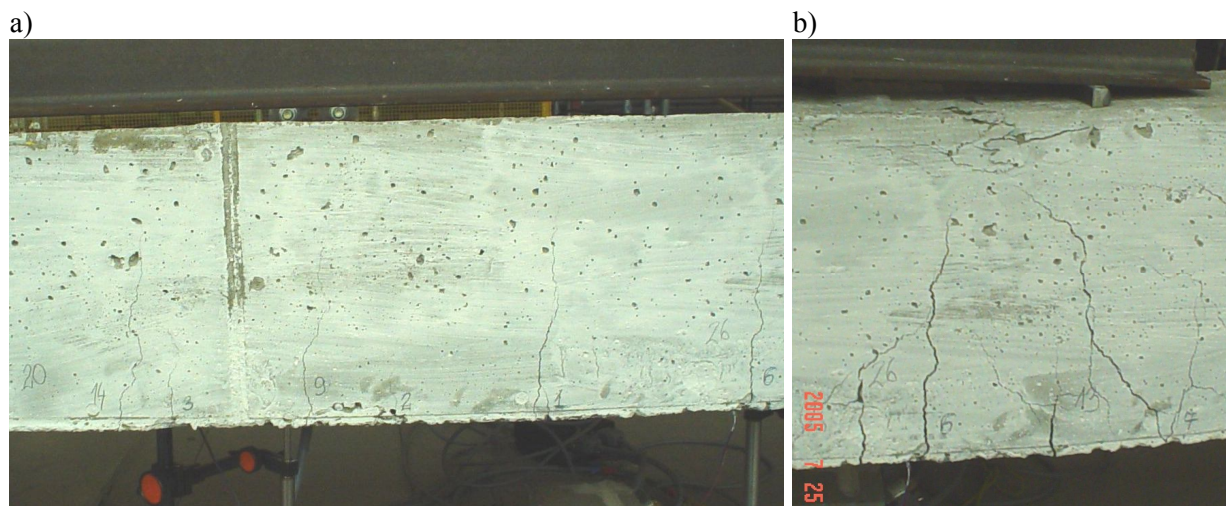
Crack pattern and damage (RB1÷RB12): a) state 2, b) state 4, failure of the beam.
